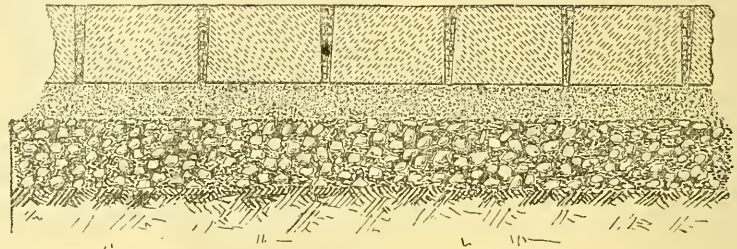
PAVEMENT AS CONTRACTED FOR.
